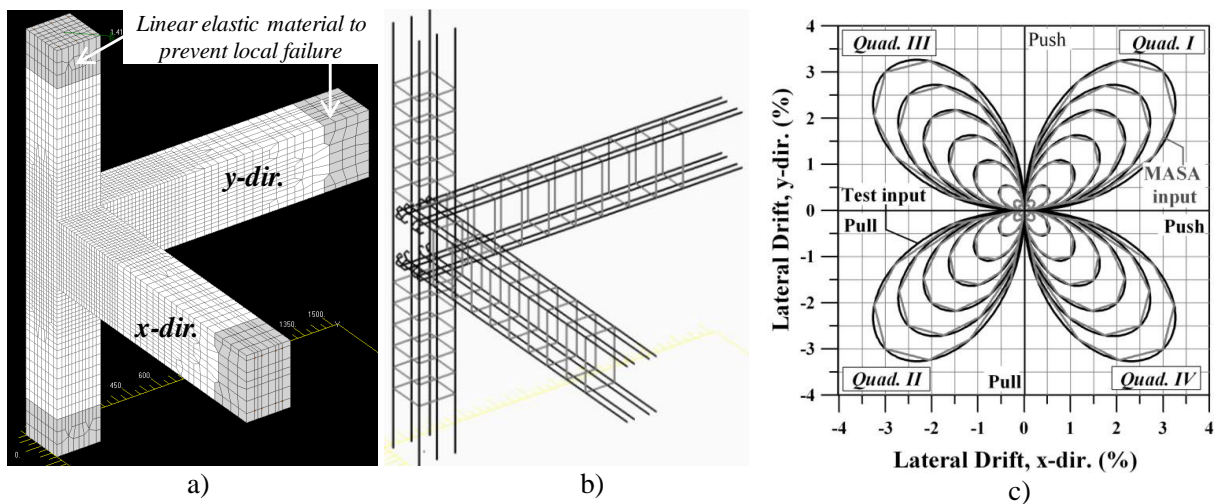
FE model of joint: a, b) discretization of concrete and reinforcement; c) load input
